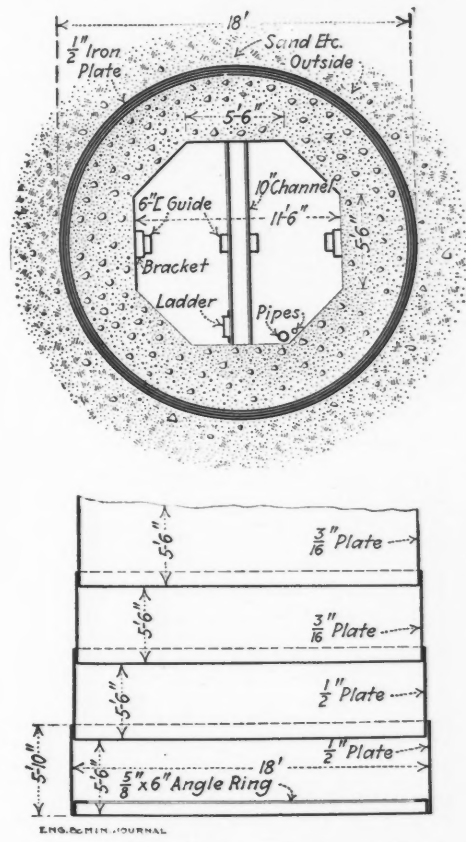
DROP SHAFT THROUGH OVERBURDEN IN PLAN AND SECTION
